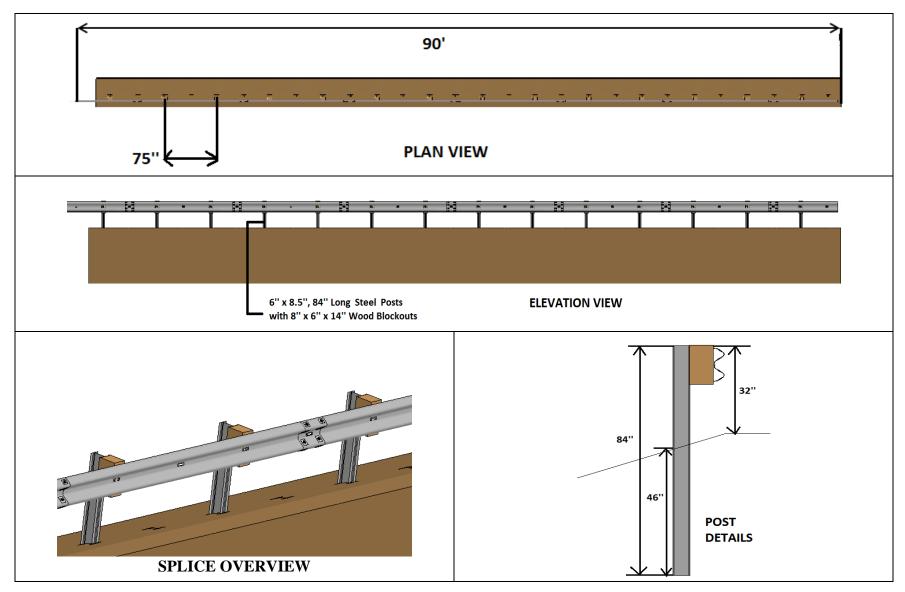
Details of the W-Beam Guardrail on 3H:1V Slope (1-ft).
